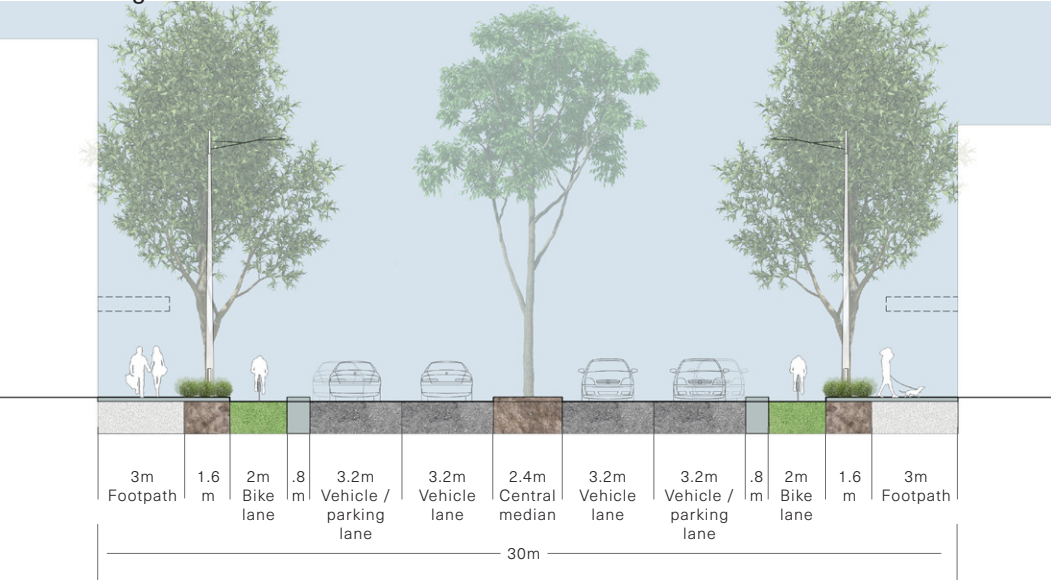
Section A-A' of Mercer Street north block showing the long term proposed condition
